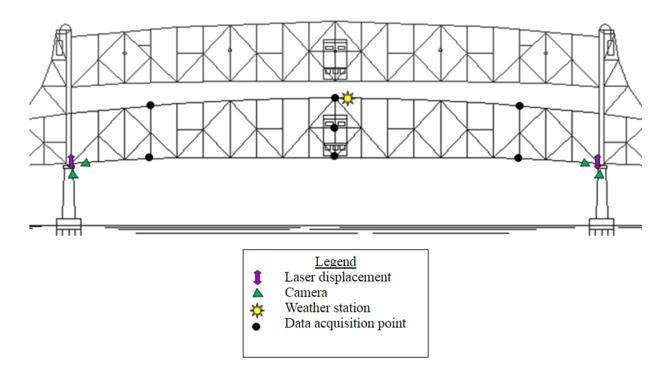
Example Instrumentation Plan from the Lift Span Related to Bridge Operations
